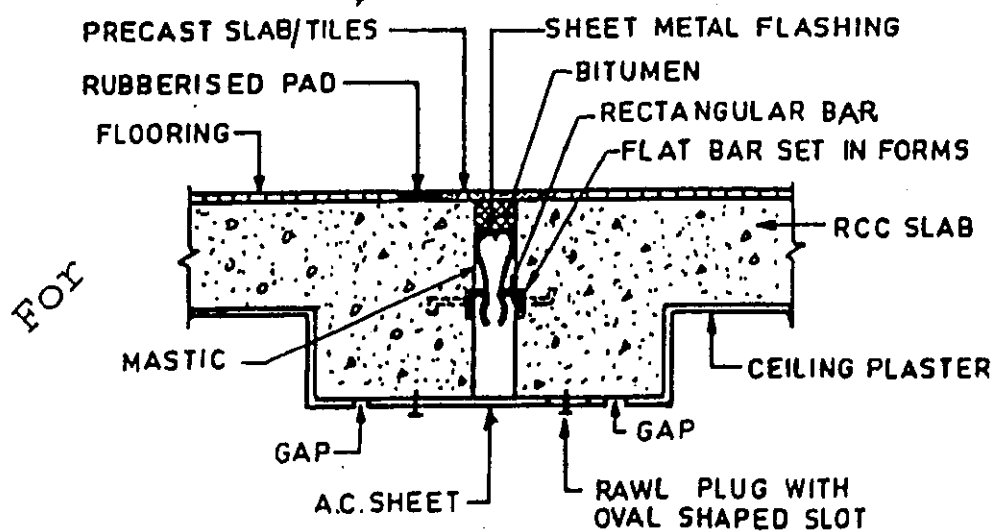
TYPICAL DETAILS OF SEPARATION OR CRUMPLE SECTION (Continued)
